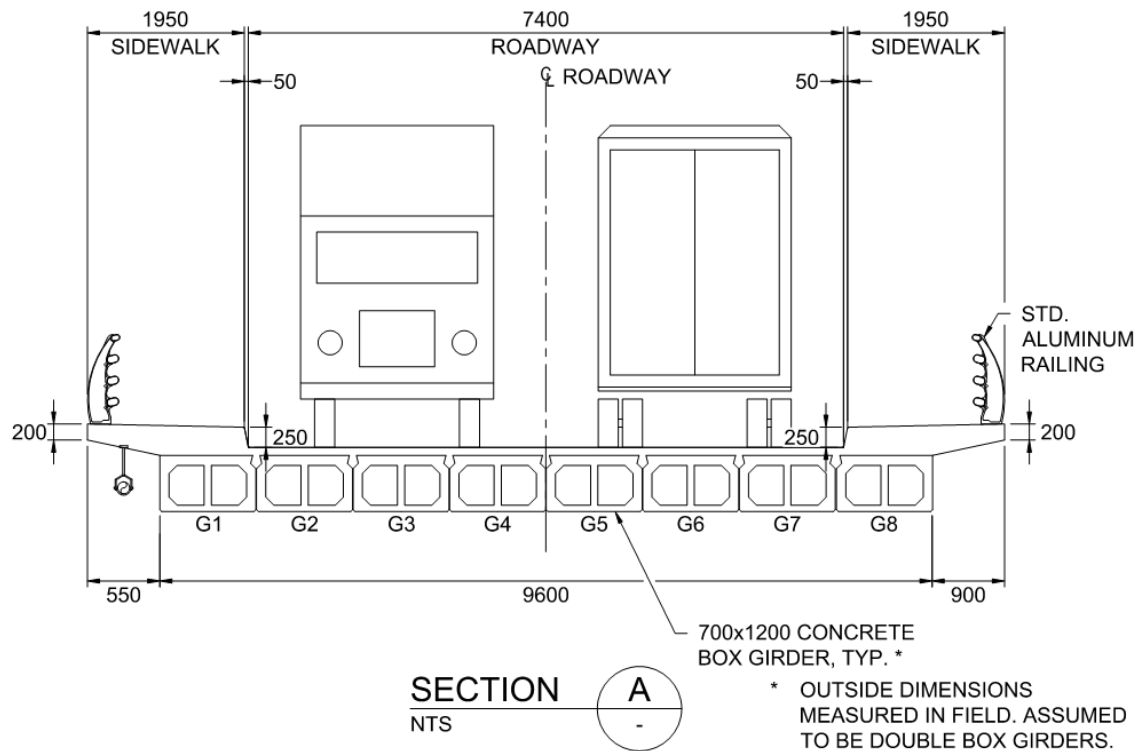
Cross Creek Road Bridge over Harvey Creek – Section
